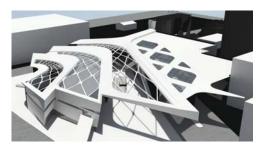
Iterations of roof design: patterns on the roof not refined.
